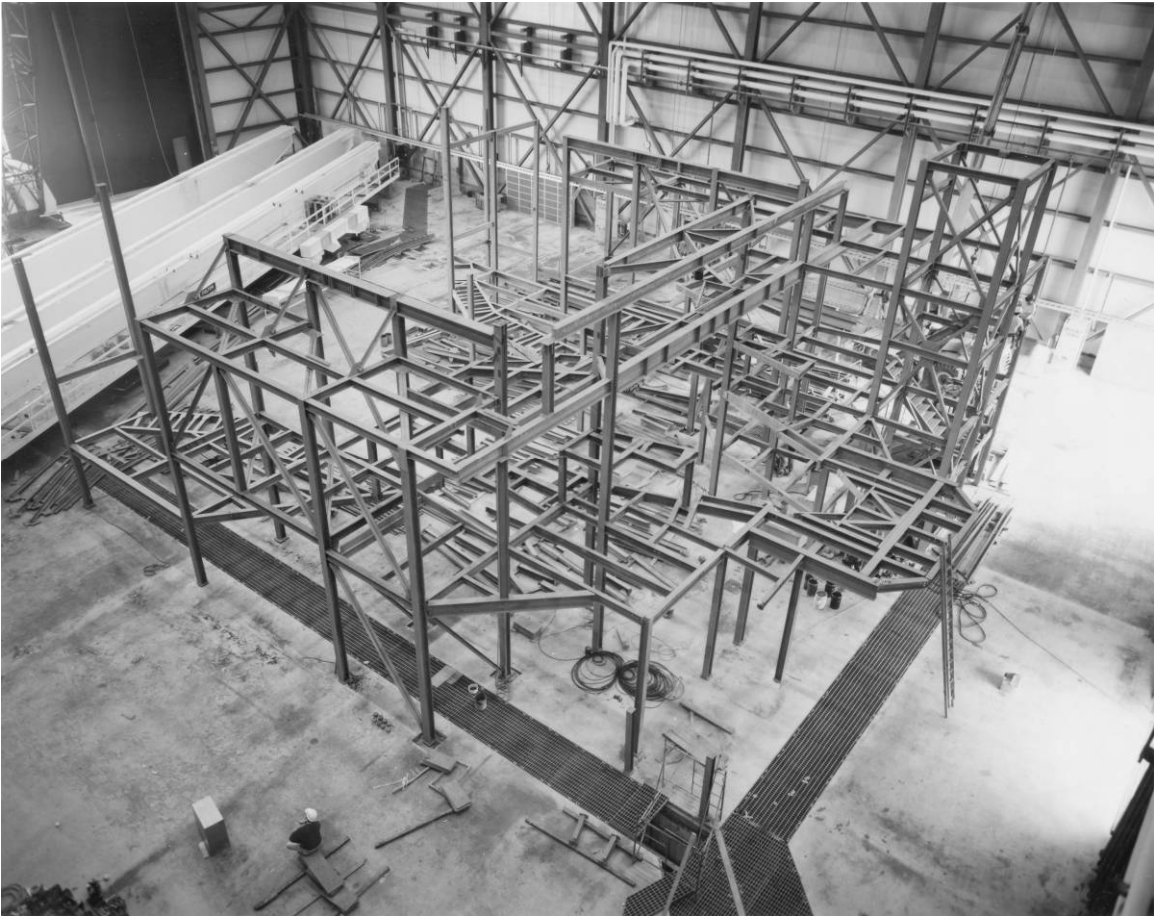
View of OPF High Bay No. 1, nose area platform installation, March 11, 1977.
